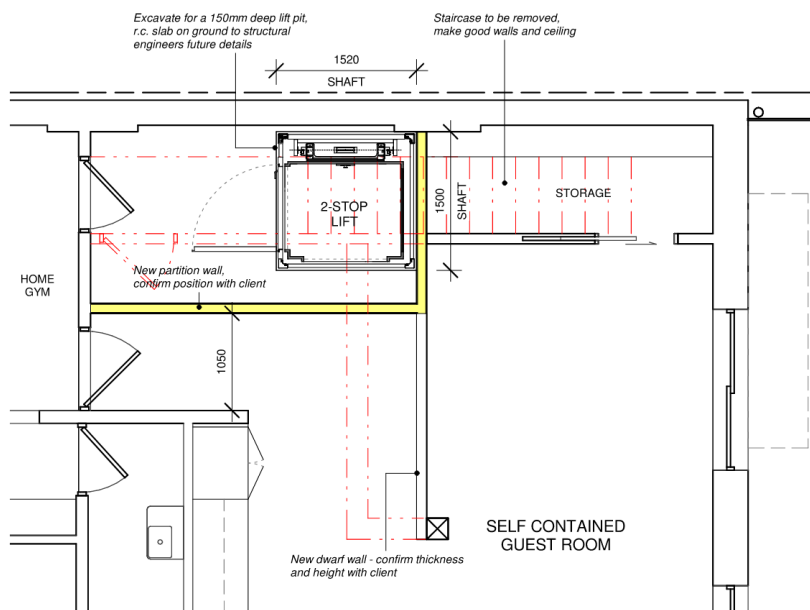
Lift Plan – Ground Floor Proposed (Source: HallGroup & Co)
